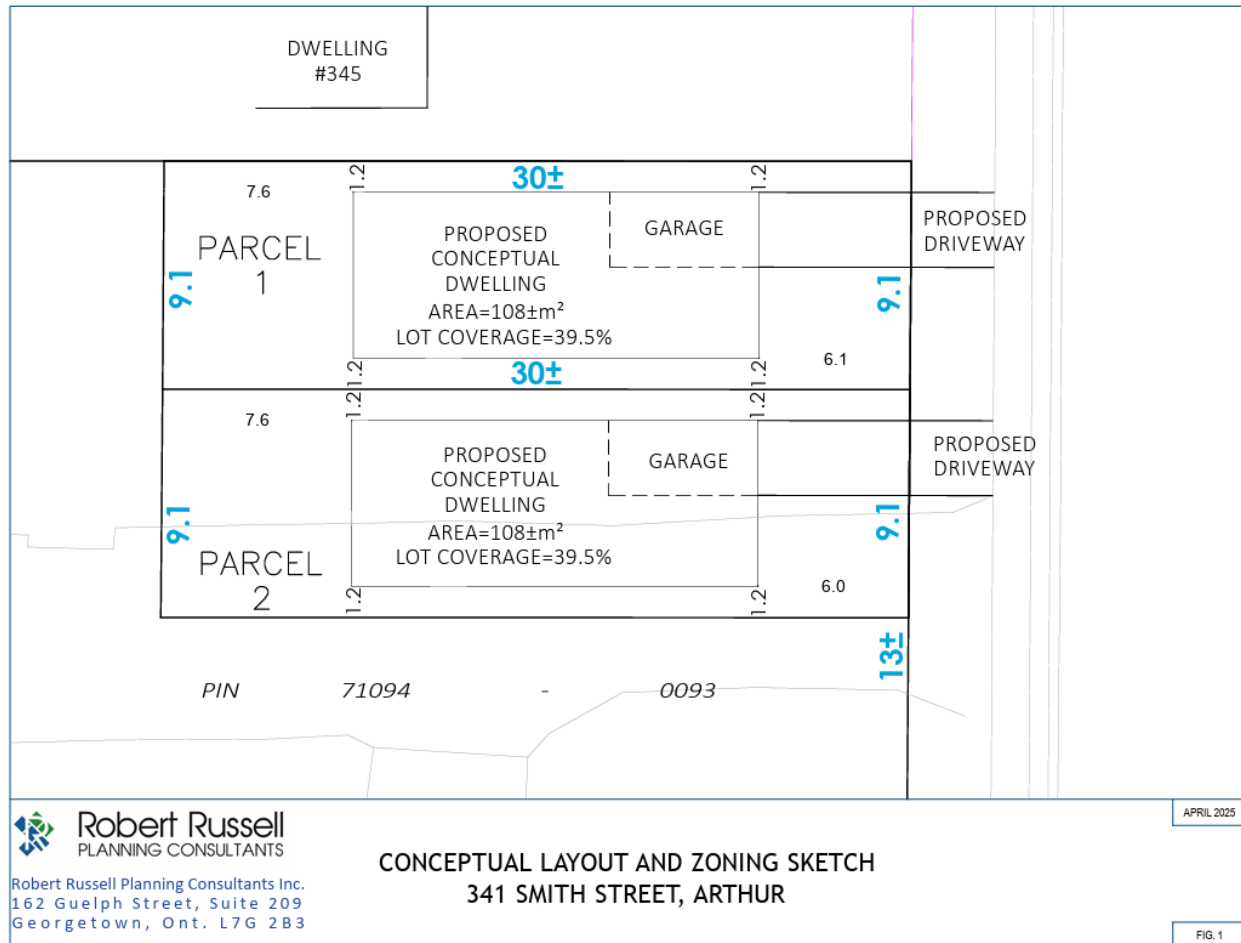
A Site Plan prepared by Robert Russell Planning Consultants.
